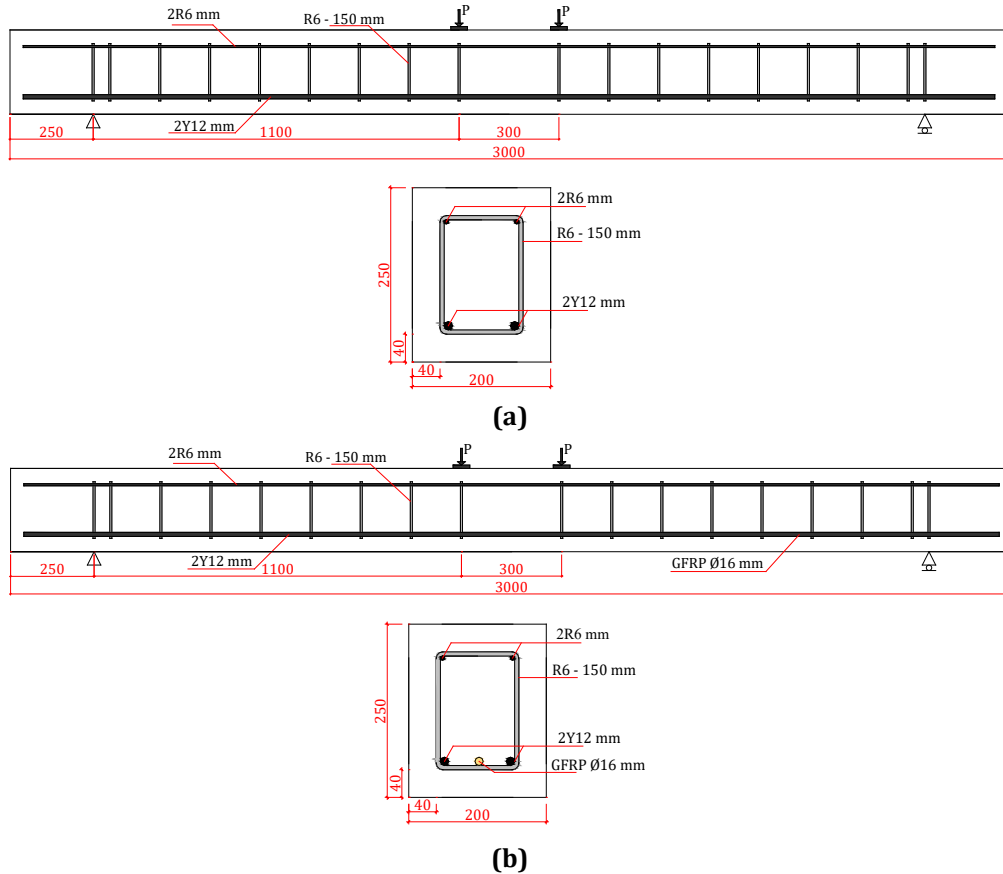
Dimension and detail of specimens (a) Reinforcement of beams HB-N and HB-M; (b) Reinforcement of beams HB-N-G and HB-M-G
